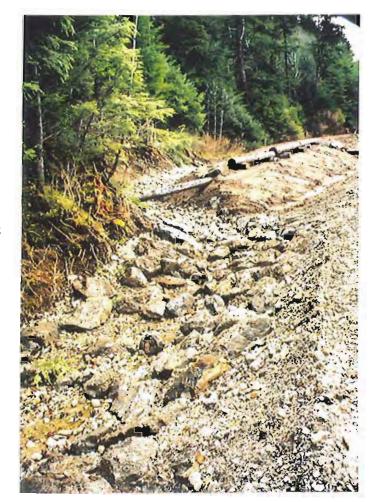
Looking across the middle portion of the APC/Sitka fandfill's northeastern disposal area on 11/23/99, showing the newly created drainage ditch along Sawmill Creek Road.
